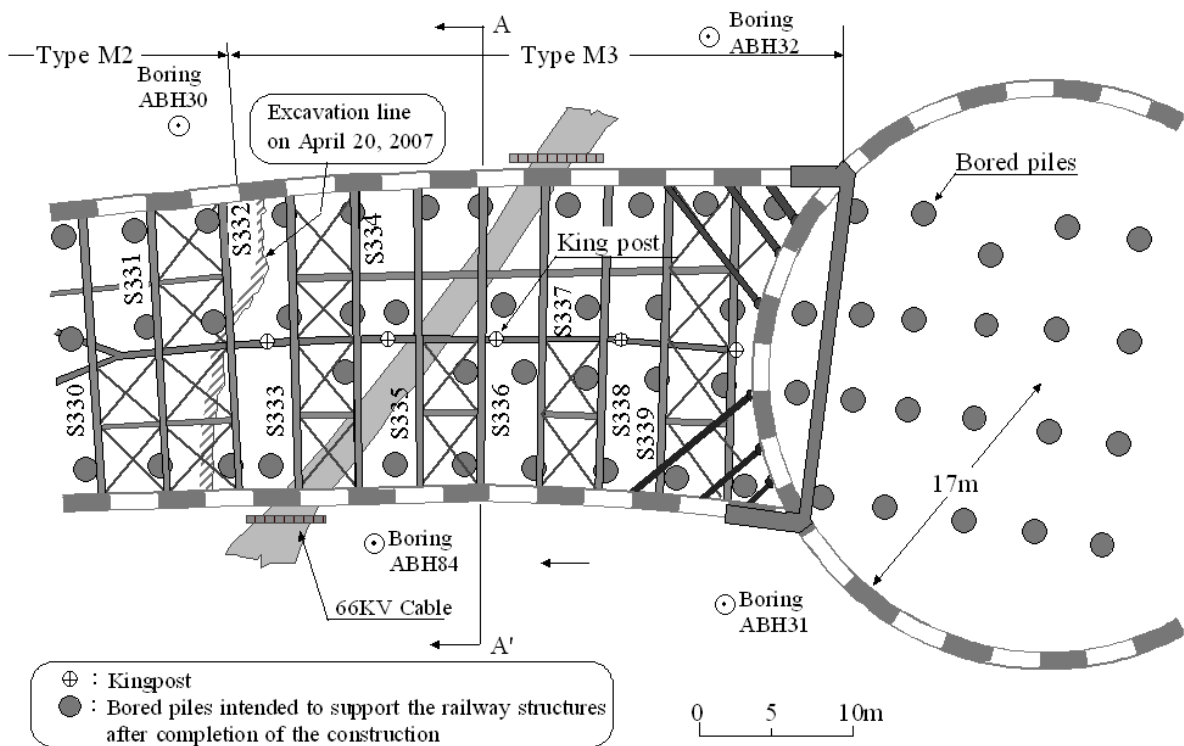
Plan view of the Type M3 section due west of the access shaft.
